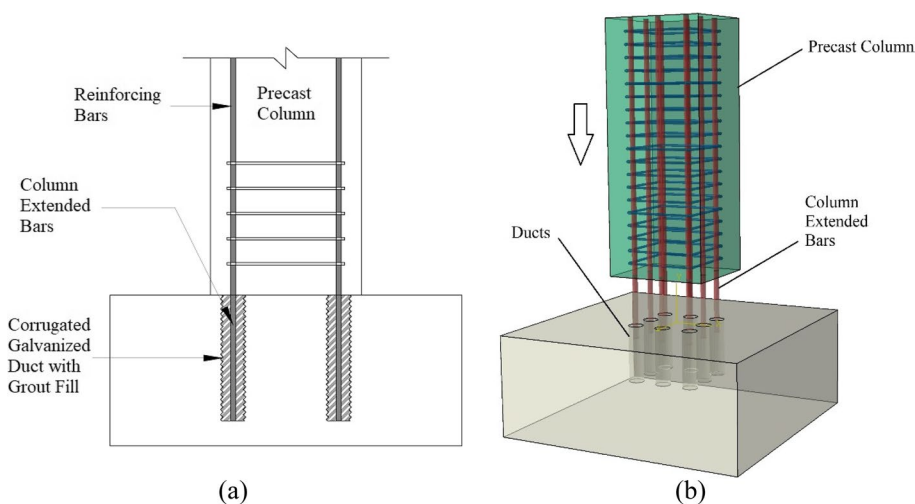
Grouted duct connection: a Section (b) 3D view (© Munzer Hassan, ETS)
